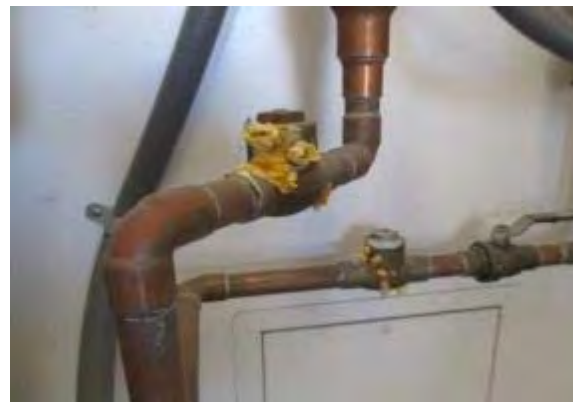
PLUMBING SYSTEM, DOMESTIC SUPPLY AND SANITARY, SCHOOL
